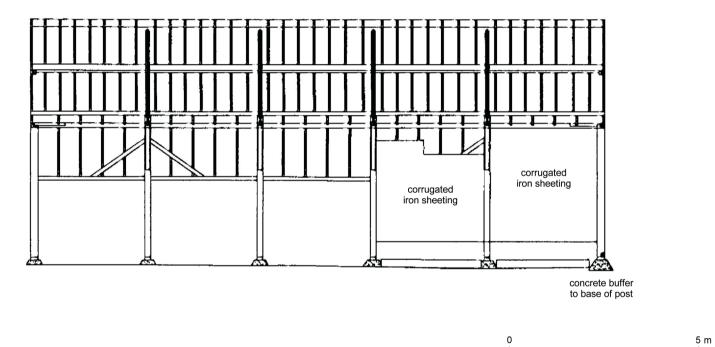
Structure 5, 1898-1918 Dutch barn south-west frame.
